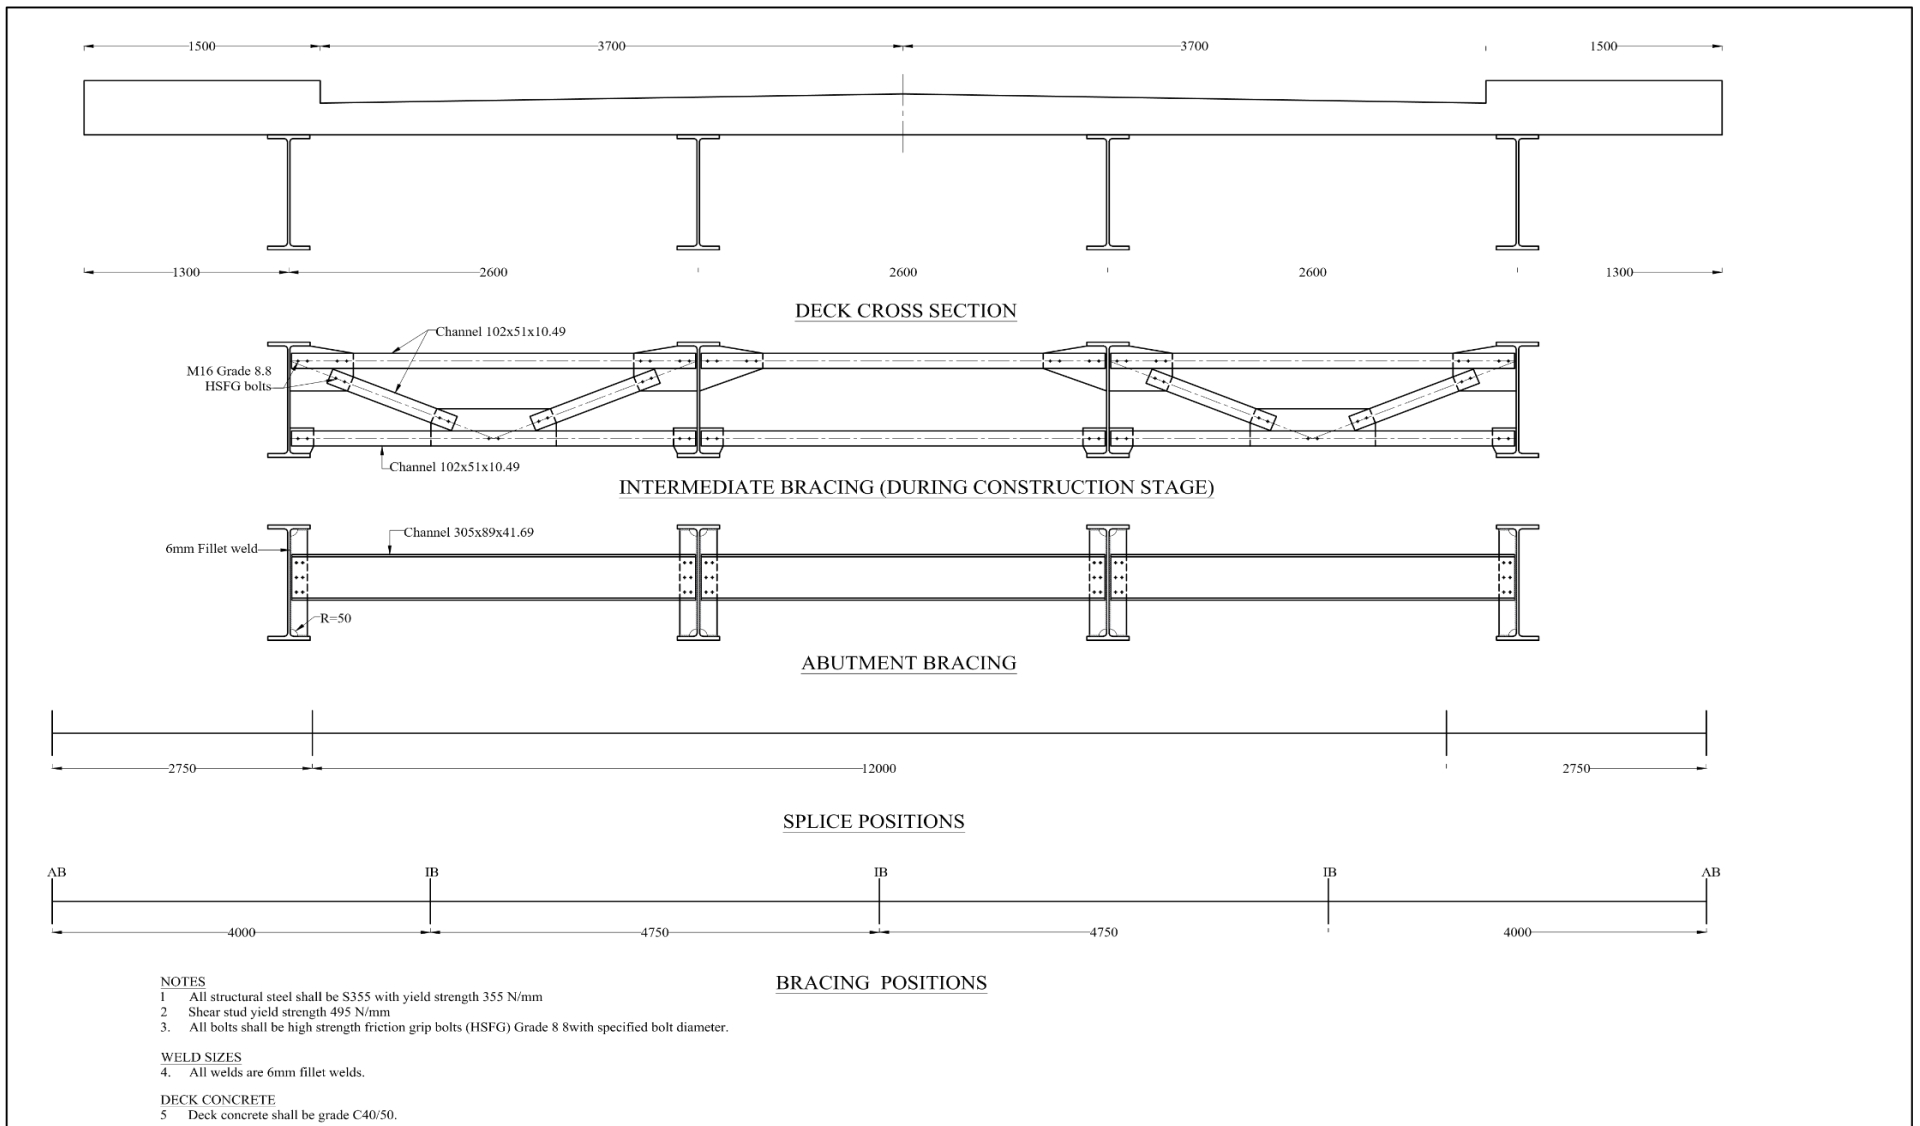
STEEL CONCRETE COMPOSITE BRIDGE DECK SPAN 17.5m
